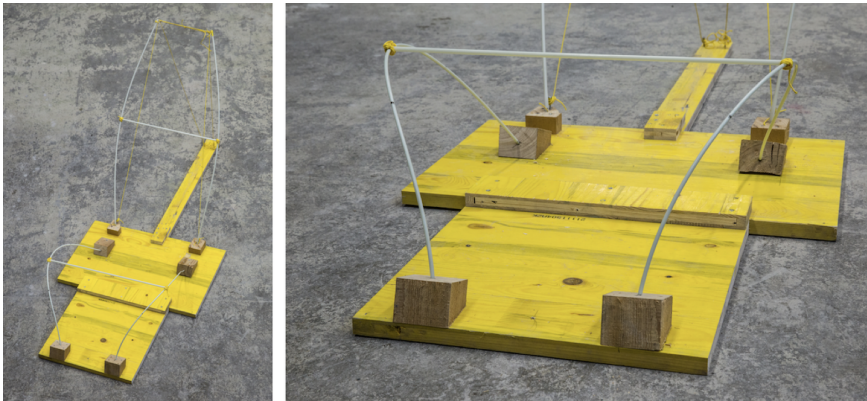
Tensioning GFRP rod setup test before assembly with textile
